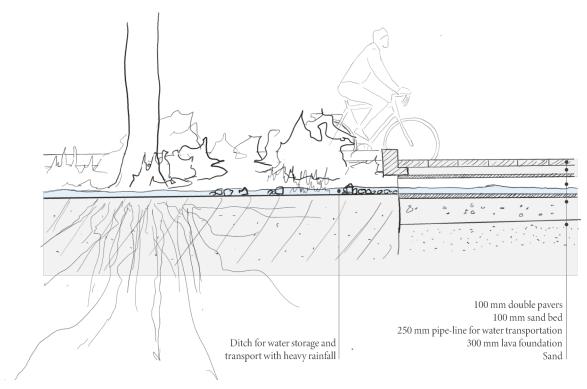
Section CC. A pipeline is placed under the pavement where cars and pedestrians need to cross the ditches, to ensure that the water is connected along the whole street.
